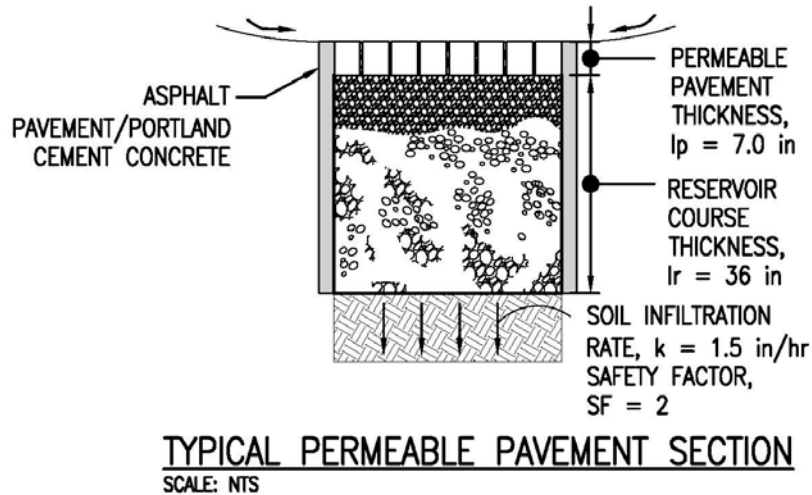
PERMEABLE PAVEMENT DETAILS
